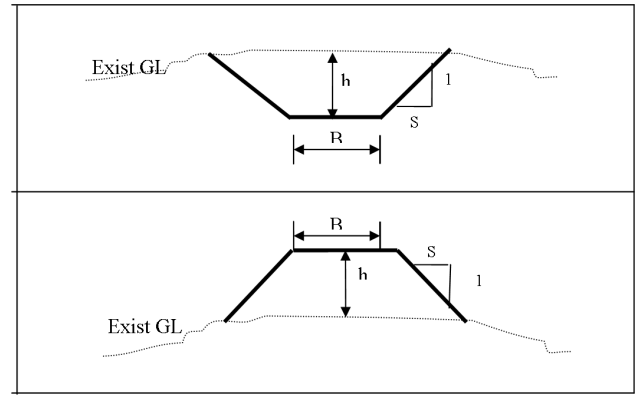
Typical cross-section for cutting and filling of road surfaces.
